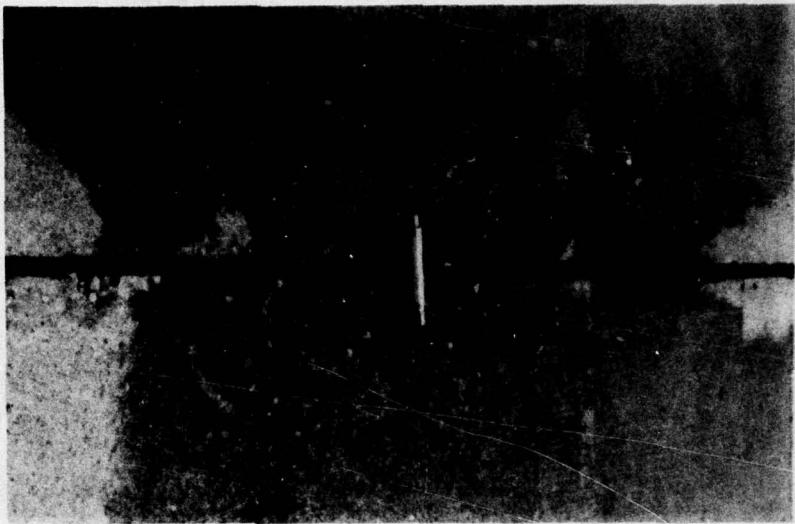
Light Severity Joint Seal Damage. (This Condition Existed Only on a Few Joints in the Pavement Section. If All Joint Sealant Were as Shown, It Would Have Been Rated Medium.)
